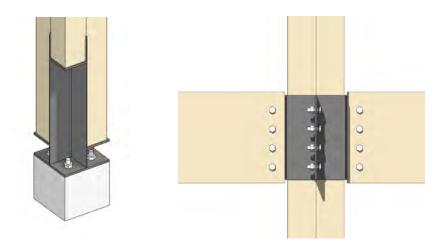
Double forked column - base, own illustration Fig. 4.09 – Double forked column - connection detail, own illustration
